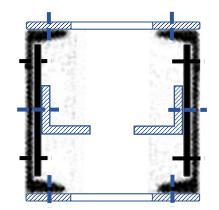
Current (left) and reinforced (right) sections of 14-15 members
